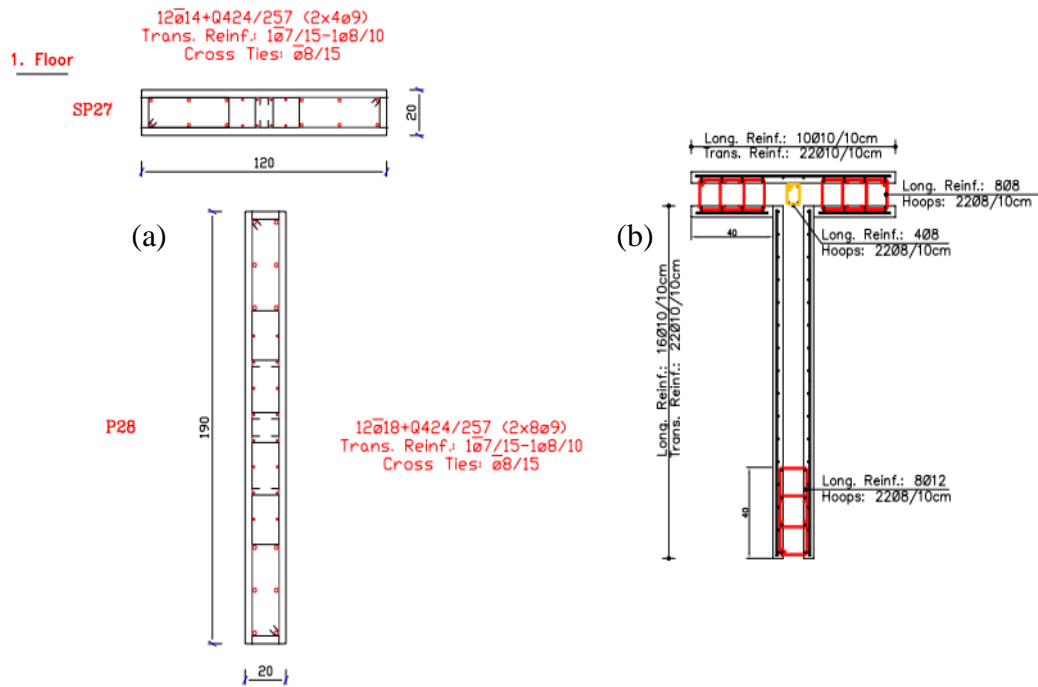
"P28" and "SP27" Double Wall Conversion; (a) Monolithic Wall, (b) Equivalent Double Wall
